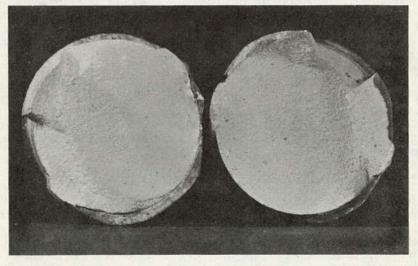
Fracture surface of reinforcing bar (specimen 3112).
